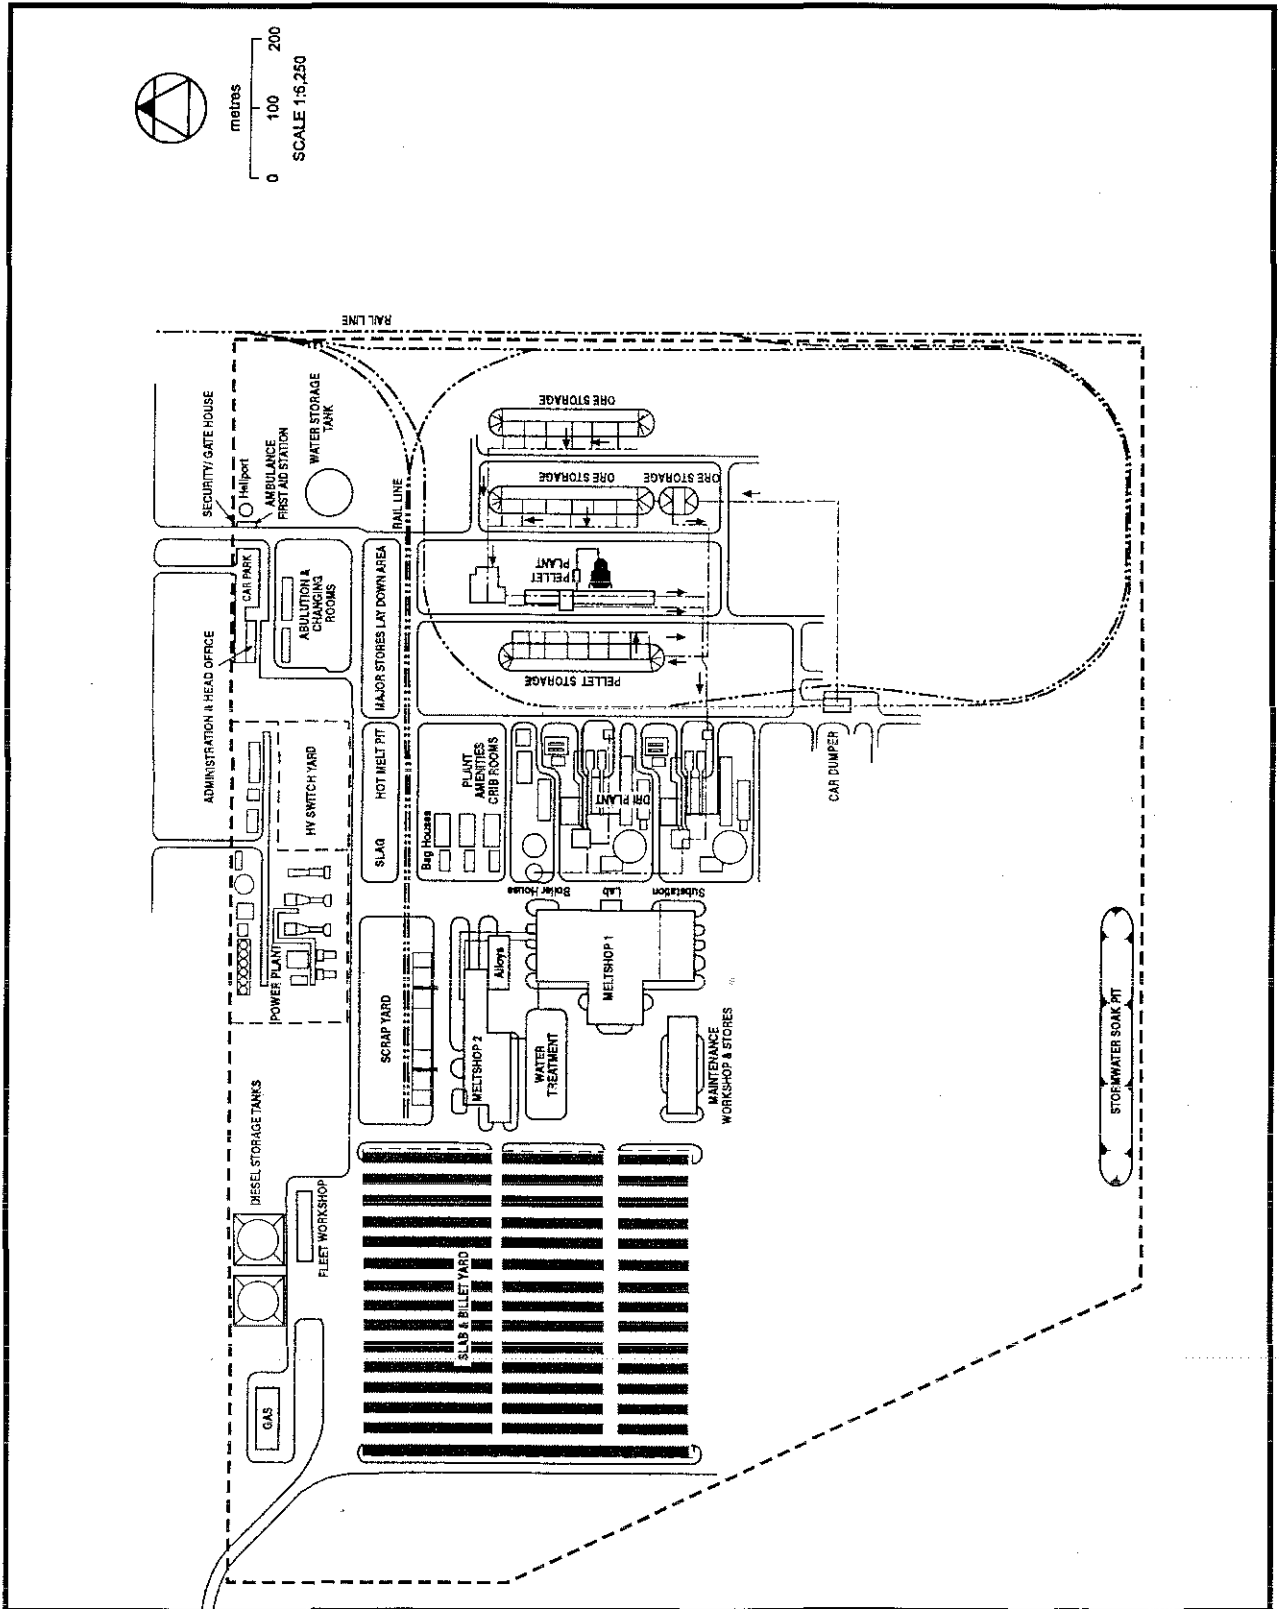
Geraldton Steel Plant, Oakajee, Plant Site Layout (Source: Tingay and Associates, 1997a)
